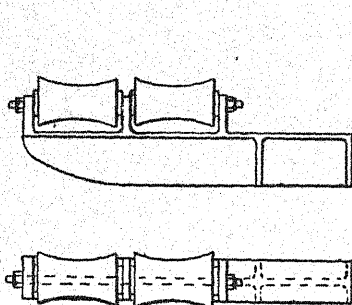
Elevation and Plan of Roller Bracket for Pipes.
